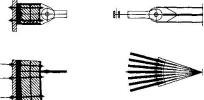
Spoked wheels, the spokes are made of vertical steel slats.
